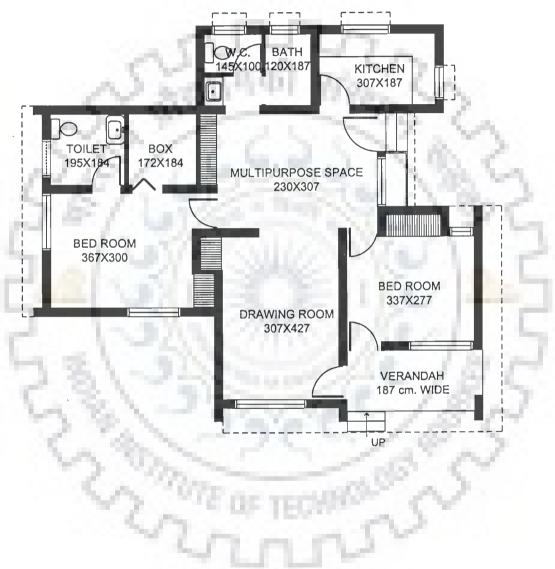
Plan of Project No. 5 (Plinth Area = 90.20 sqm; Floor Area = 73.13 sqm)
